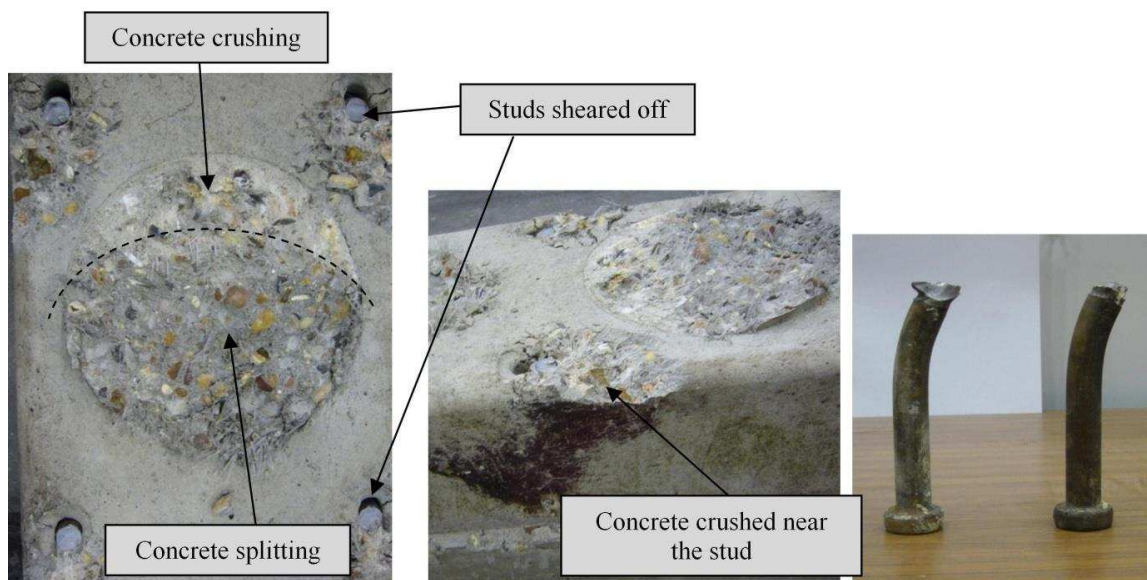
Failure profiles of the web-welded stud shear connection
